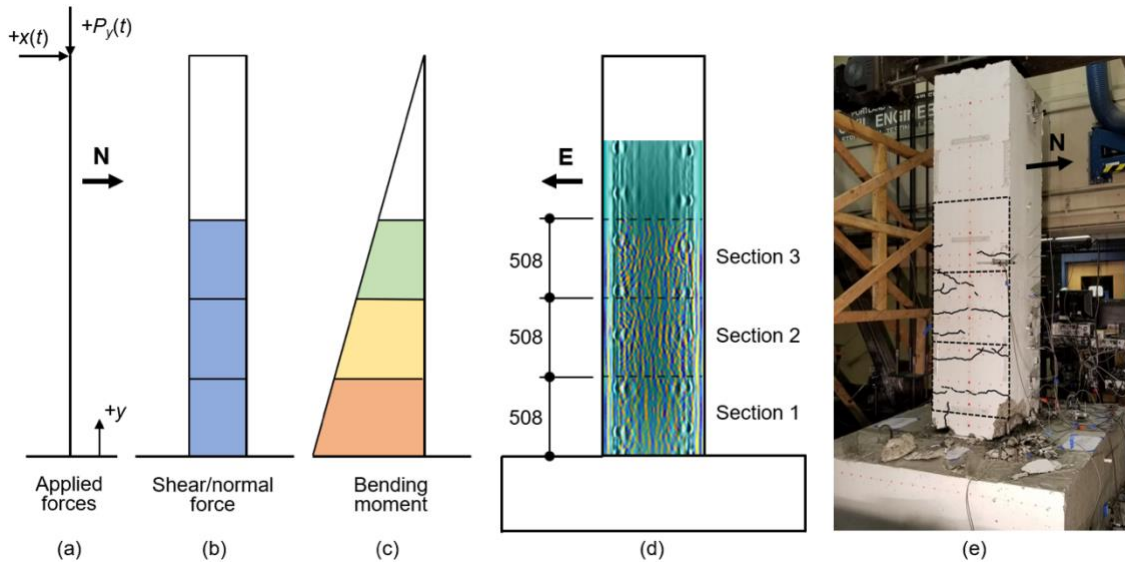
Illustrations of (a) applied forces, (b) and (c) internal force curves (qualitative), (d) elevation view of specimen north face with sample final reconstructed image and three designated damage sections, and (e) photo of east face of specimen after failure. All dimensions in (mm).
